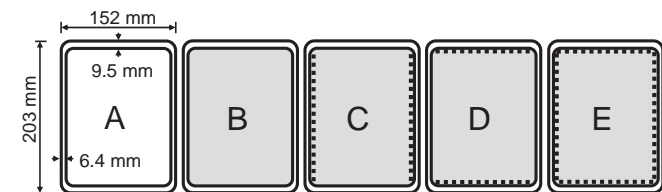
Illustration of test specimen configurations (A) empty, (B) unbonded, (C) webs bonded, (D) flanges bonded, and (E) flanges and webs bonded.
